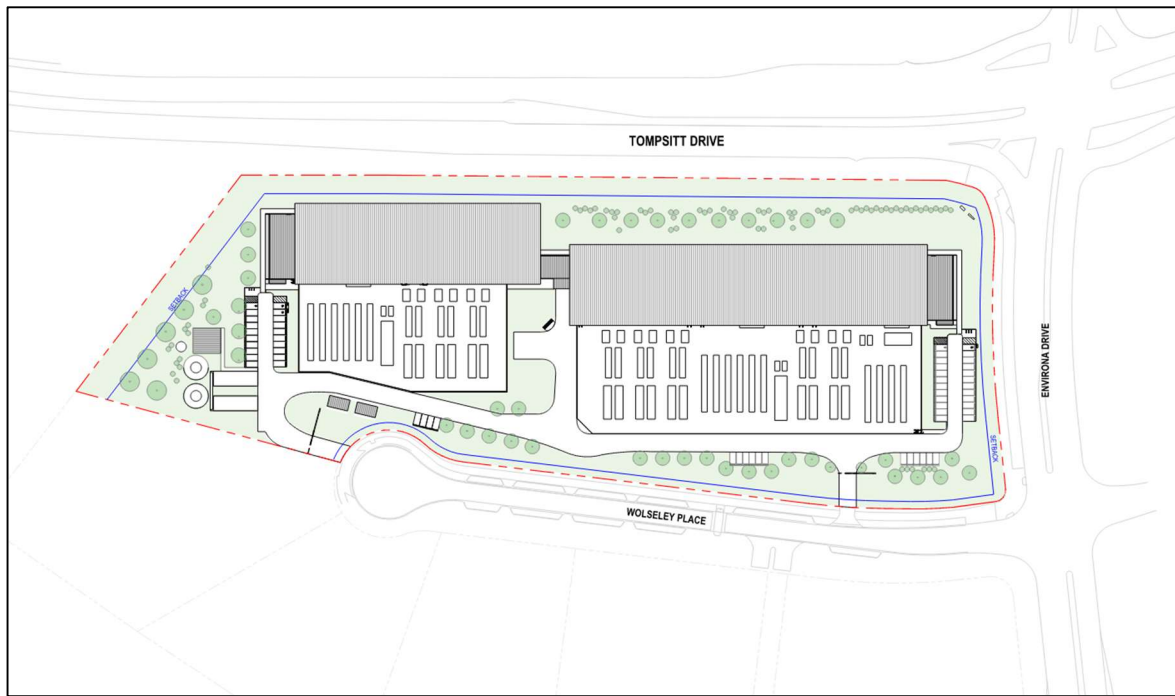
Site Layout (HDR Concept Plans, 2024)
